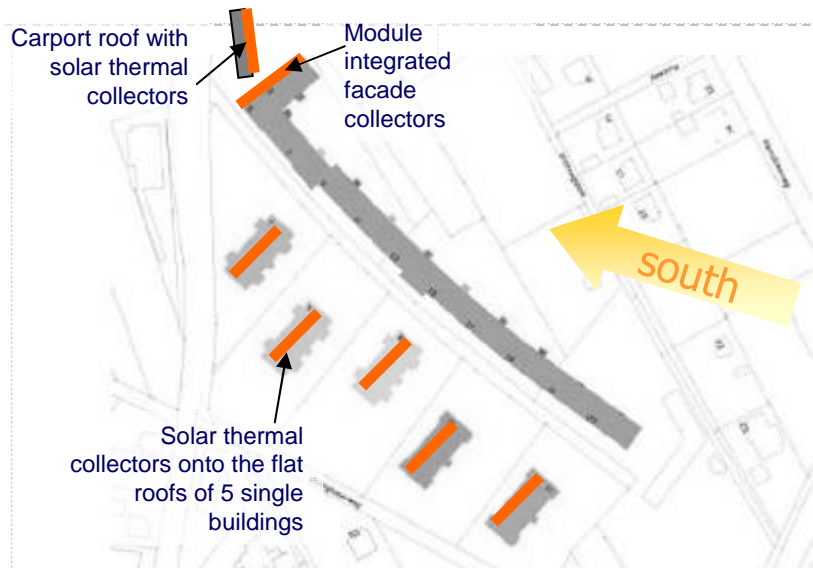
Site plan showing the solar thermal collector areas. [Source site-plan: Hohensinn ZT GmbH]
